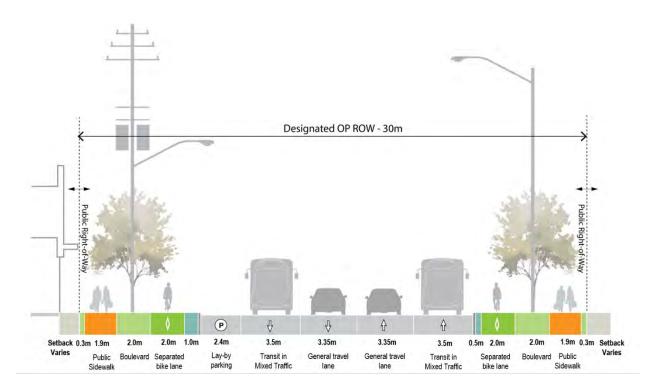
Preferred ROW Alternative (Segment 2C: Clarkson Road South to Meadow Wood Road)
